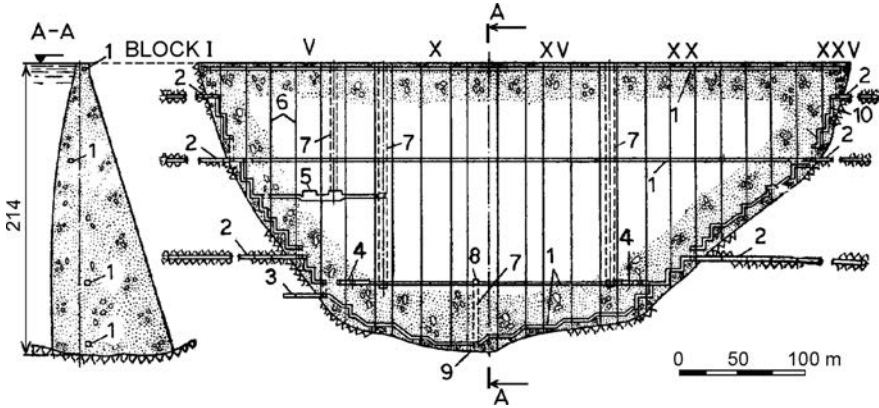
Glen Canyon dam (USA). (1) Inspection galleries; (2) tunnel in bank; (3) exit from gallery; (4) access galleries to power house; (5) gallery for gates of outlet structure; (6) joints; (7) manhole; (8) pumping station; (9) pit for collecting filtrated water; (10) stairway.
